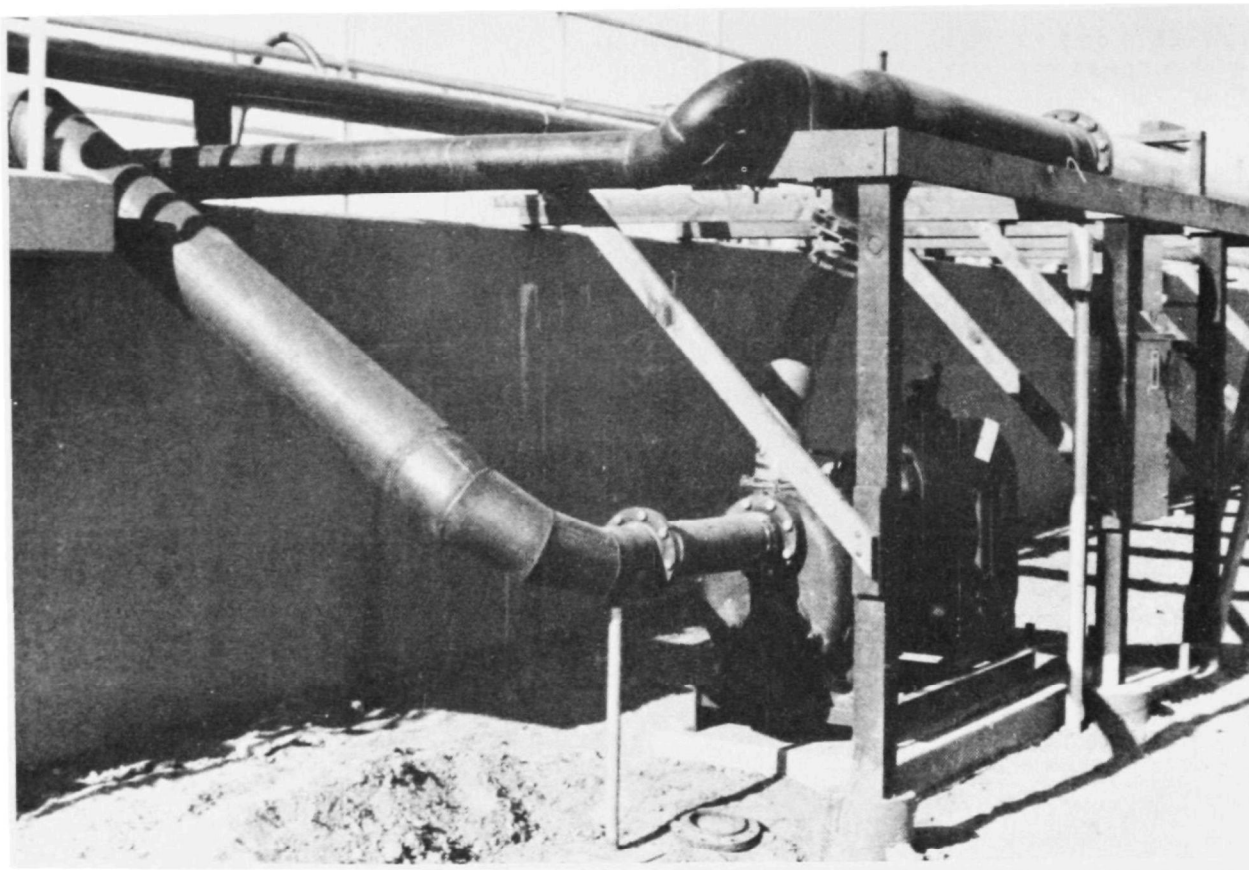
RAS pump 8 at far end of aeration basin 4, August 3, 1973. (Note steel suction and discharge piping with flexible hose connections to pump. All timber supports were set in concrete.)
